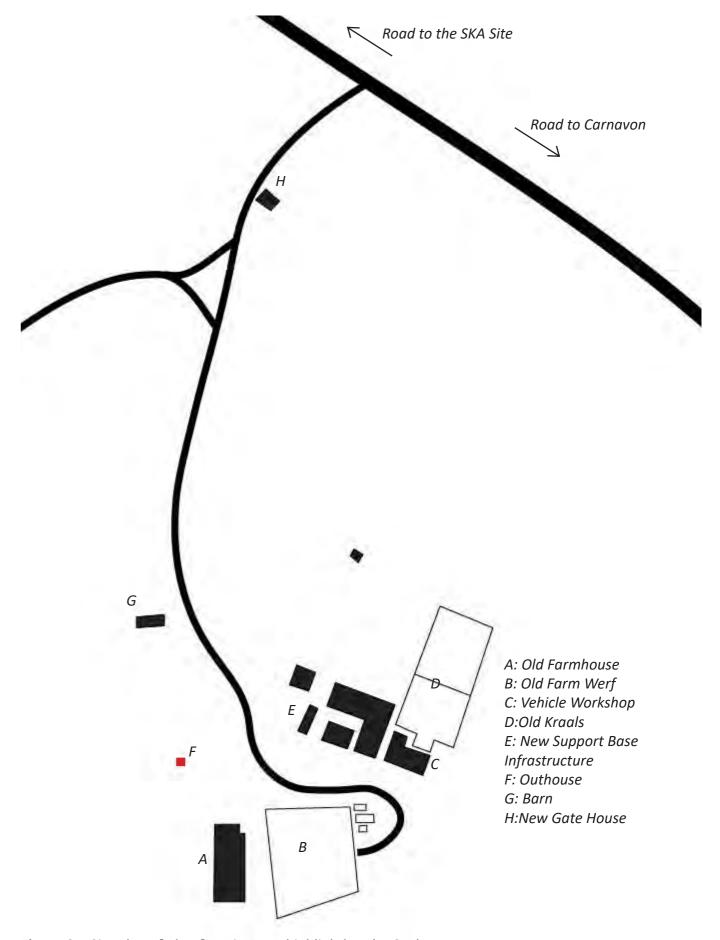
Site Plan of Klerefontein Farm highlighting the Outhouse
